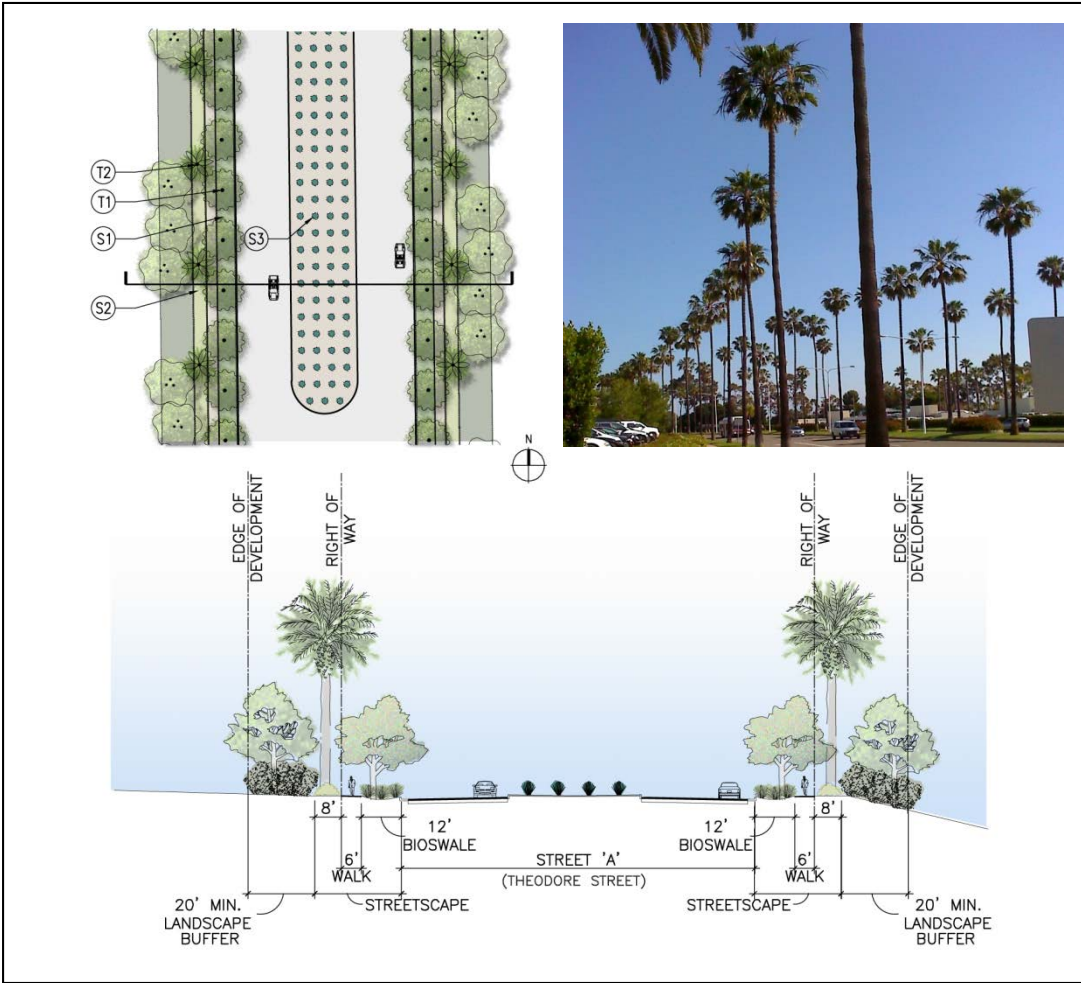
Streetscape Planting Map (see pages 4-38 to 4-42)
